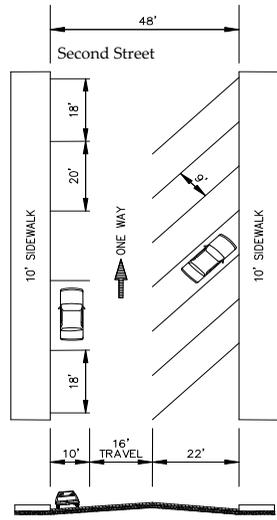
One-Way Traffic & Diagonal Parking on Second Street.
